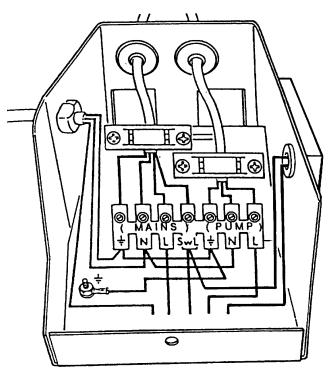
WIRING THE BOILER FOR A FULLY PUMPED SYSTEM
